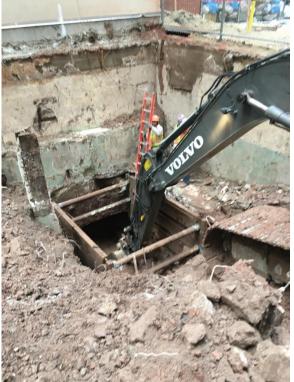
TP-2 - Final stages of excavation. Facing Northeast.
